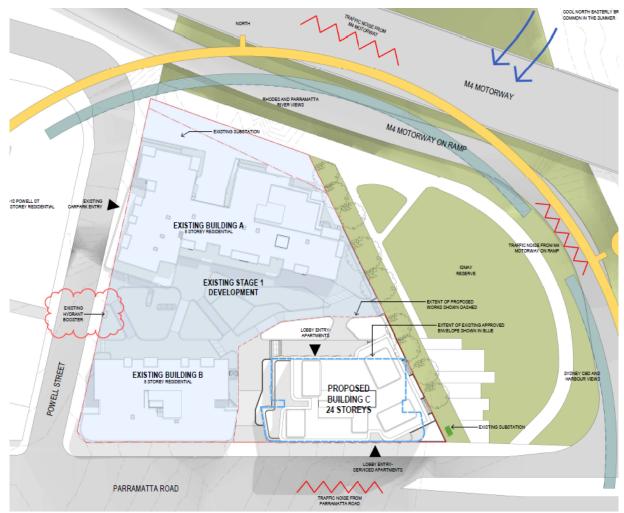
Location of Buildings A and B and proposed Building C (Source: SJB Architects).
